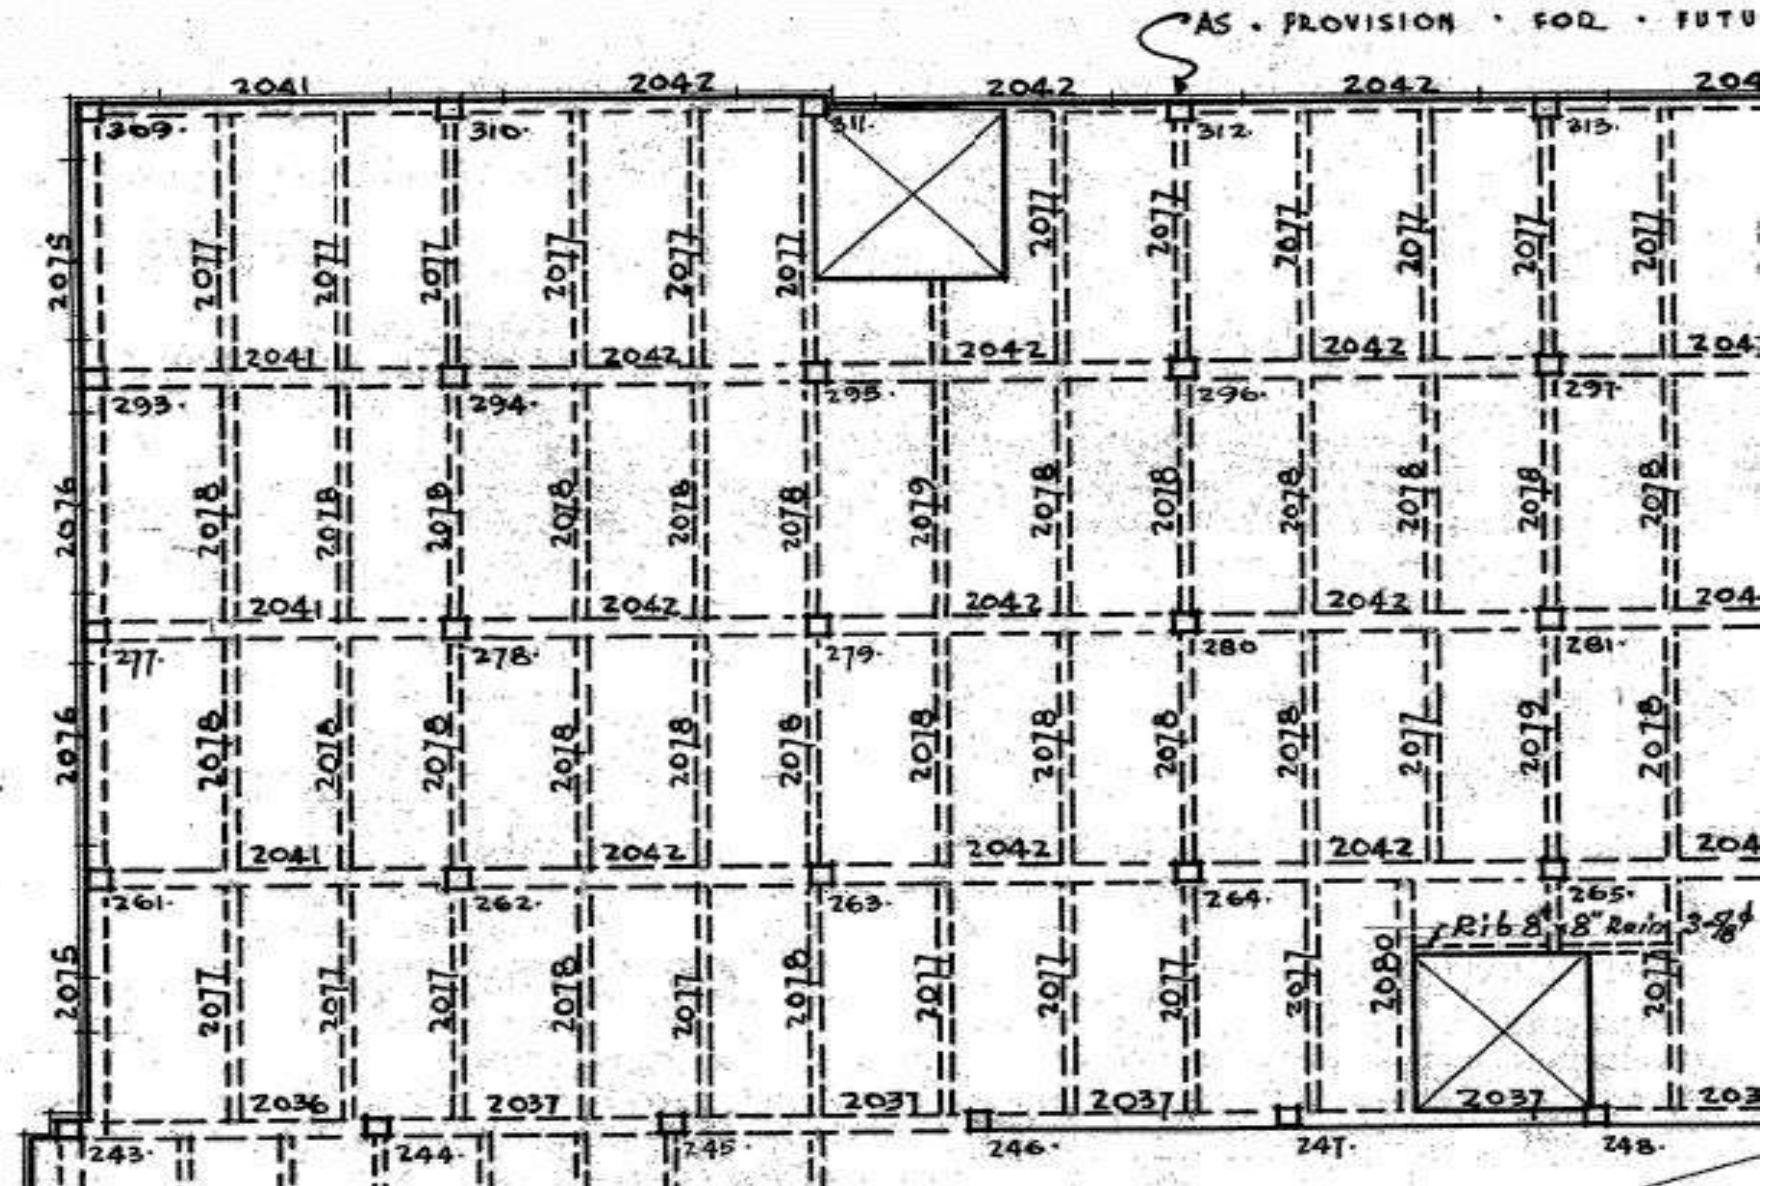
FLOOR JOIST 2078 WAS ANALYZED AS A TYPICAL FLOOR FRAMING MEMBER
